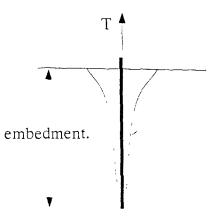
(a) Possible failure shape in geotextile pullout for shallow embedment.
